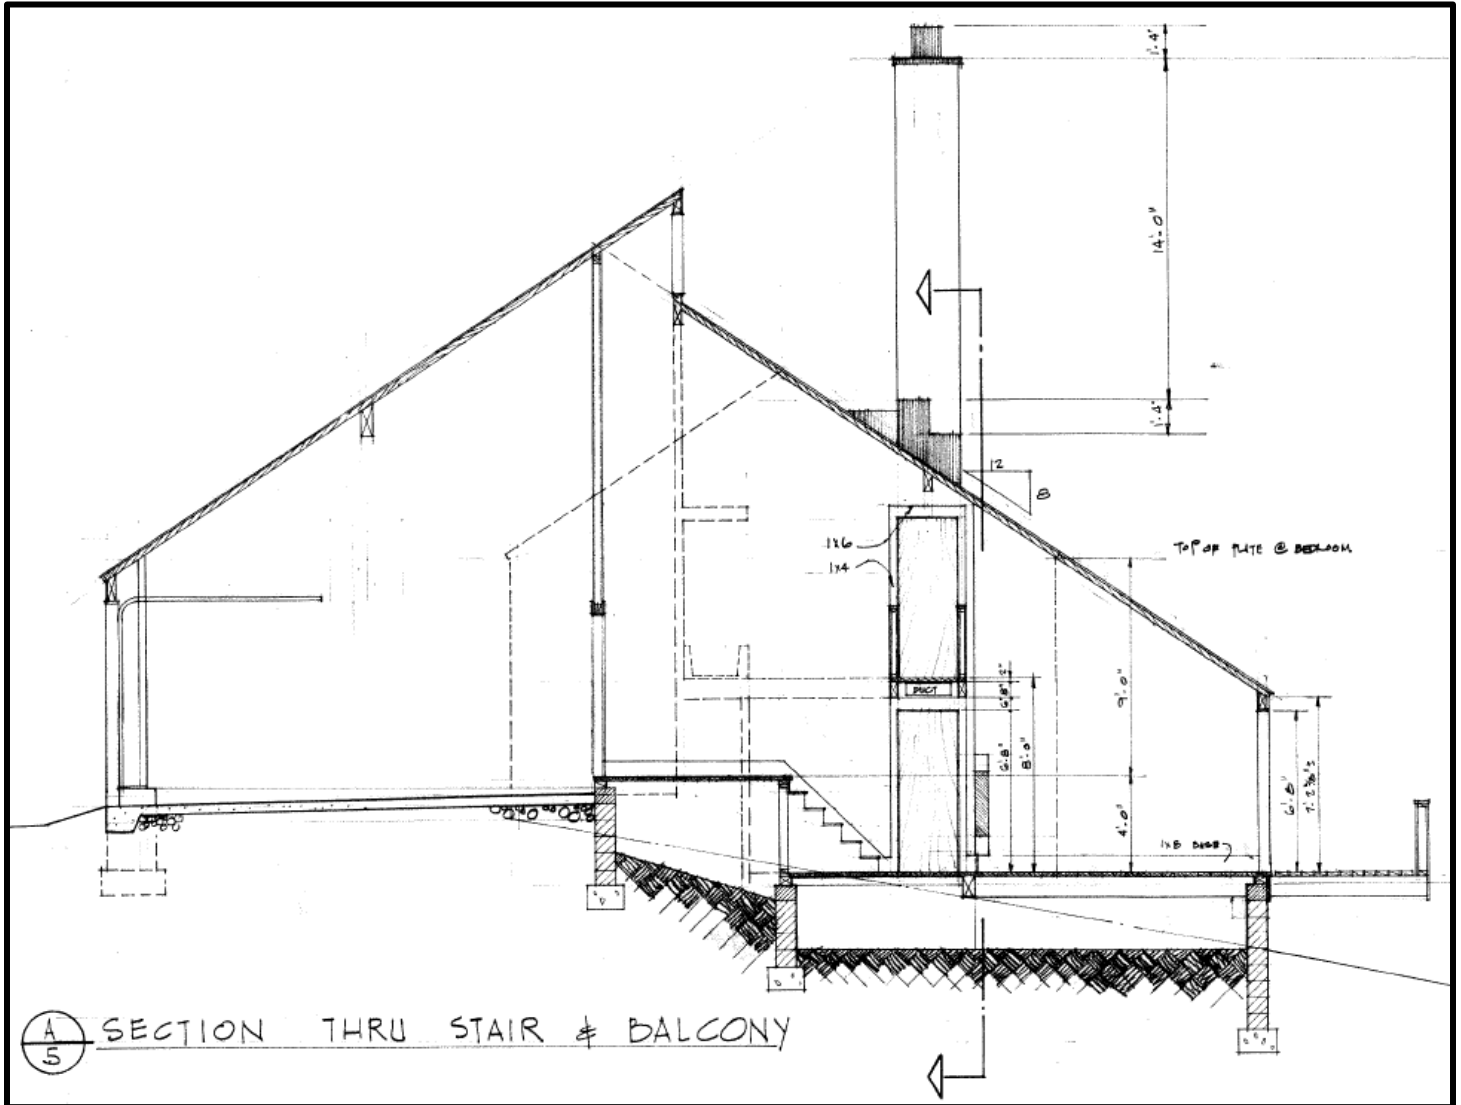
Section through Stair and Balcony, Guest House (Architect's drawings, 1962).
